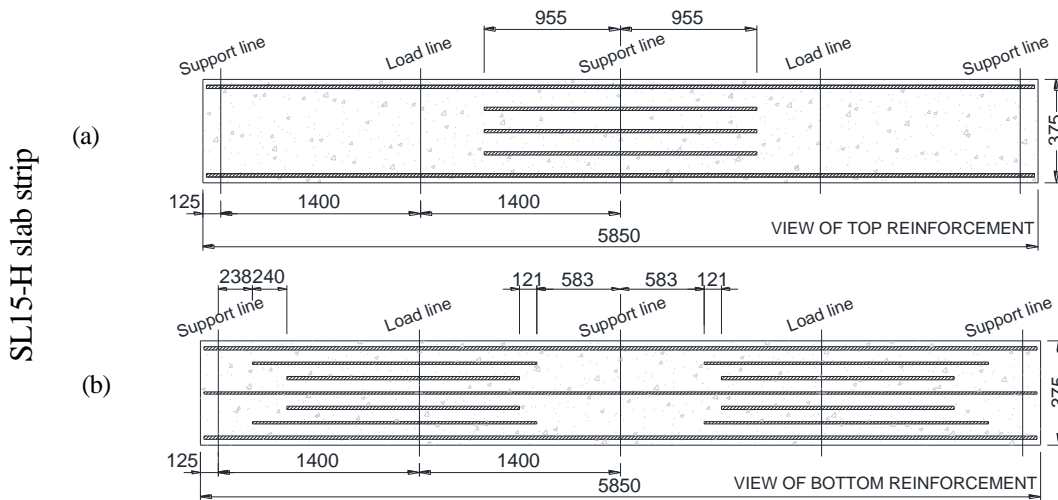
Arrangement of the longitudinal steel reinforcement of the SL15-H slab strip.
